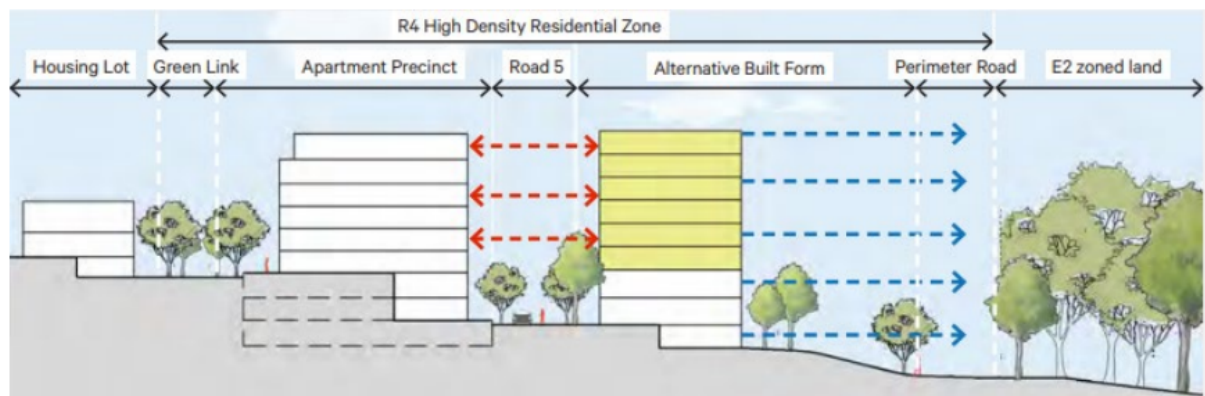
Alternative built form consistent with Planning Proposal and transition to C2 Zoned land Source: Mirvac Design
